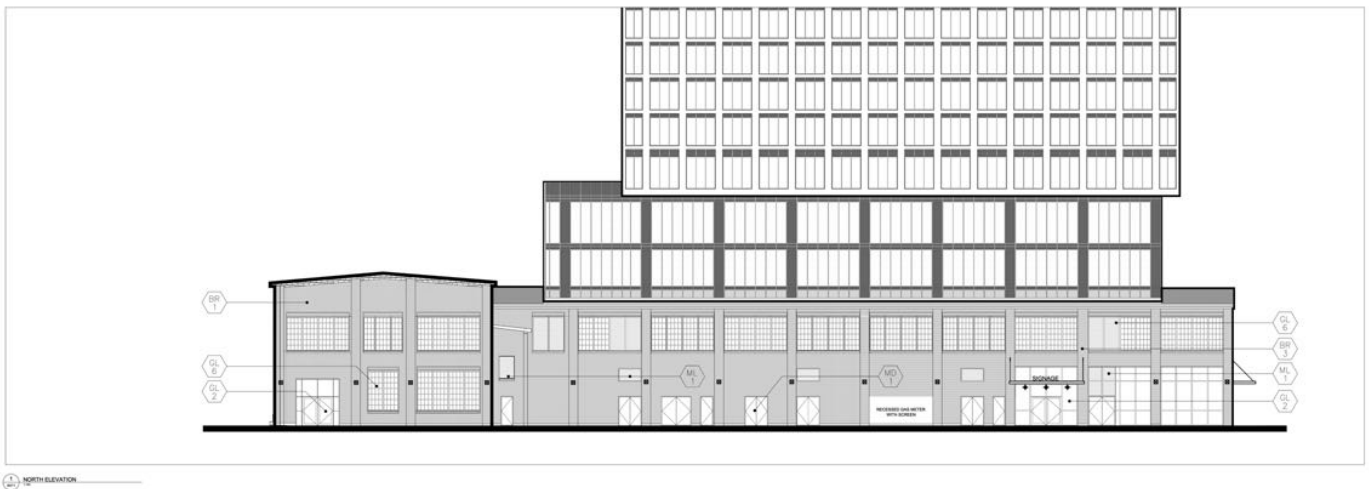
Proposed north elevation of 185 Eastern Avenue (Machine Shop building) (Core Architects Inc., 2026).
